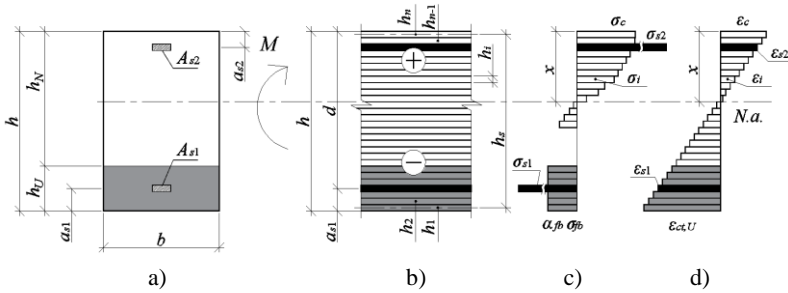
Calculation scheme in uncracked reinforced concrete composite member stage using the iterative layer method: a) cross-section of reinforced concrete composite member, b) longitudinal member section, c) stress in uncracked section, d) strains in uncracked section
